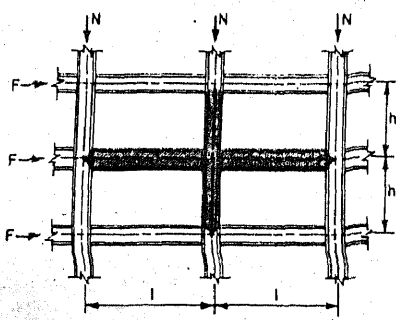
BEAM-COLUMN SUBASSEMBLAGE
